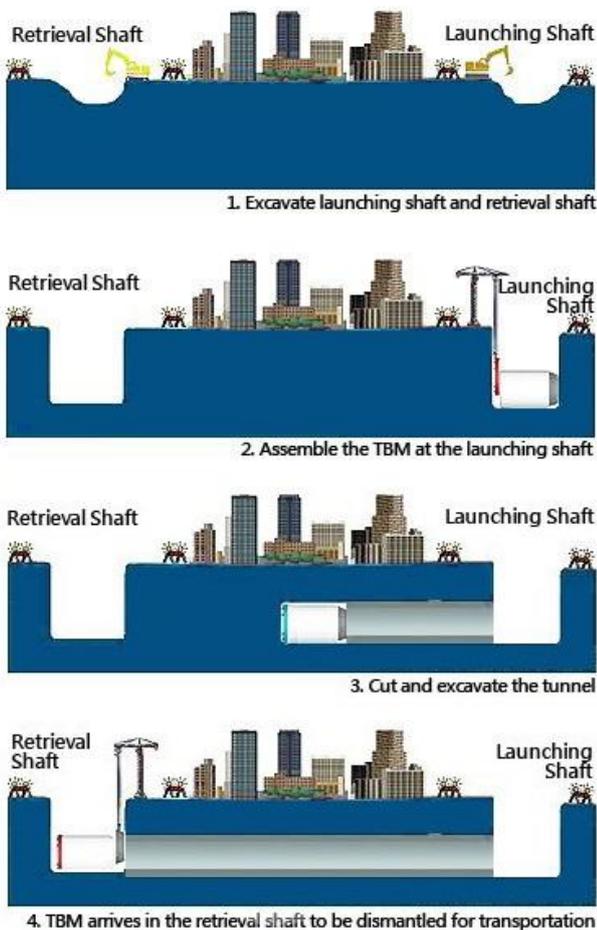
Shaft and TBM erection and movement (Source Railway Engineering)
